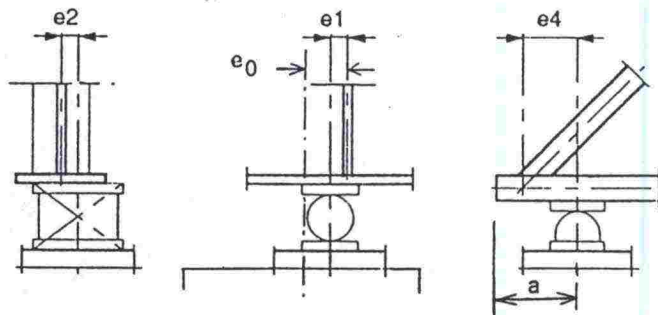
POSITION OF GIRDER OR TRUSS IN RELATION TO BEARING
